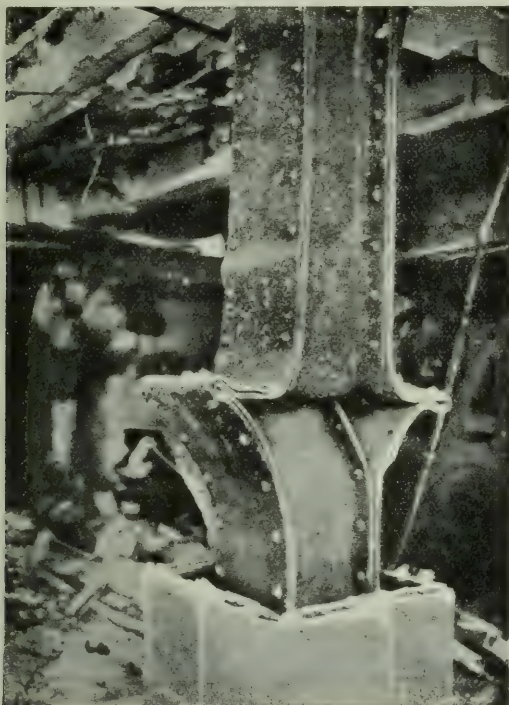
Failure of Clay Tile Protection to Steel Column caused a Buckling of Column from Heat.
